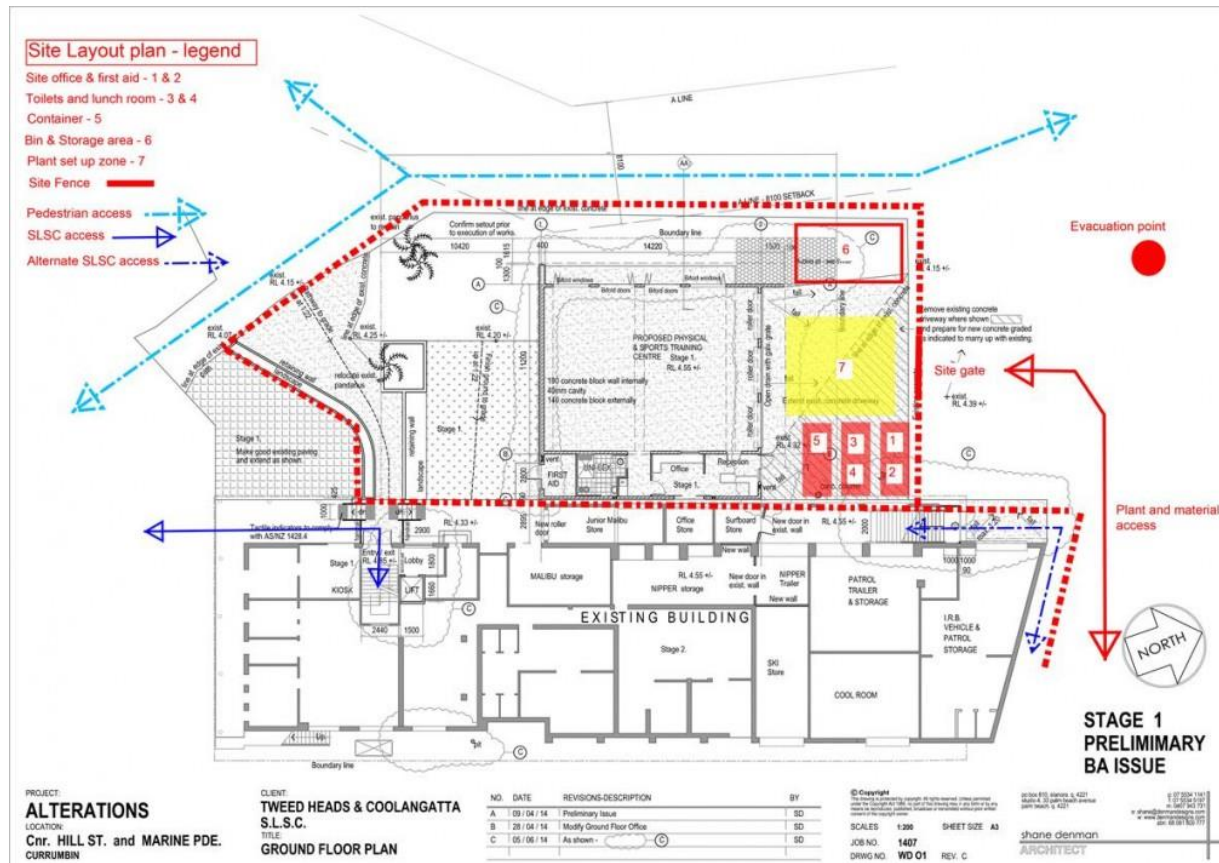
Typical Construction Site Layout Plan. Retrieved from the website: Construction Tuts. <https://www.constructiontuts.com/construction-site-layout-planning/>
